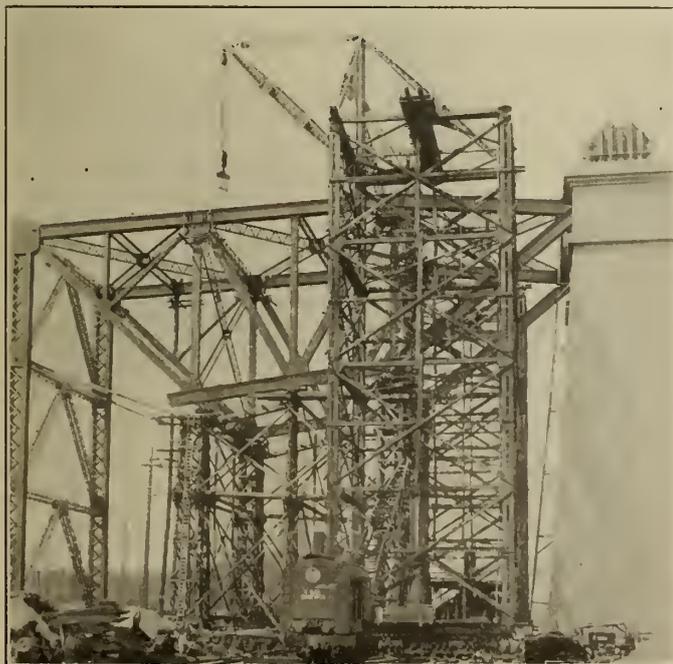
Main Span, North Side—Erection of Falsework Tower and Span—Final Stage.
